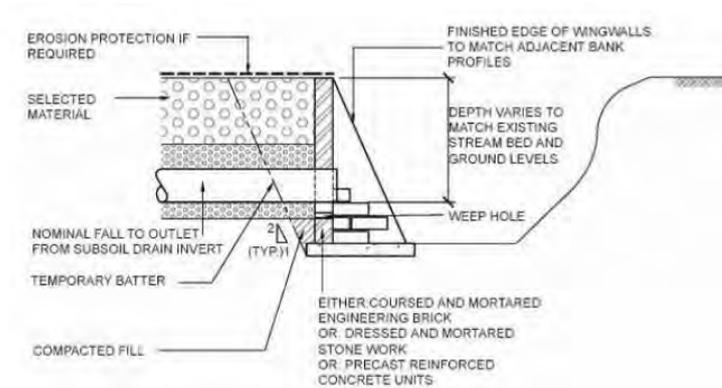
Masonry headwall to outfall (Network Rail, 2010)
